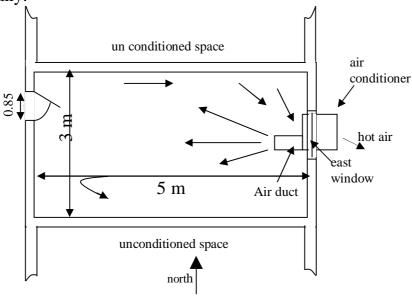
Test room plan with window type air conditioner (a ceiling fan to insure good space air circulation).
